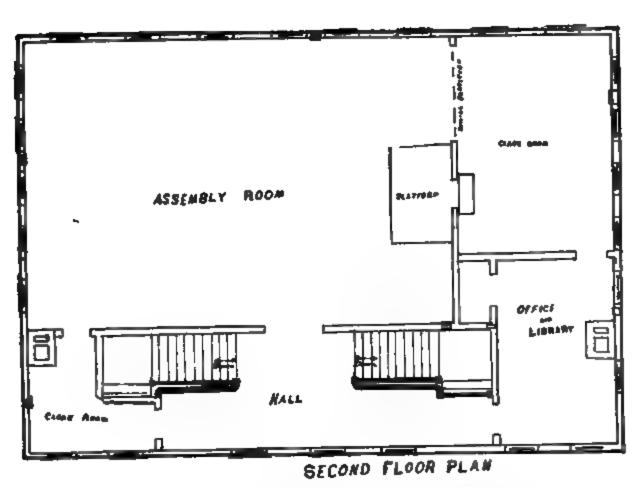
Underwood School Building-Second Floor Plan. For building see figure 1.
